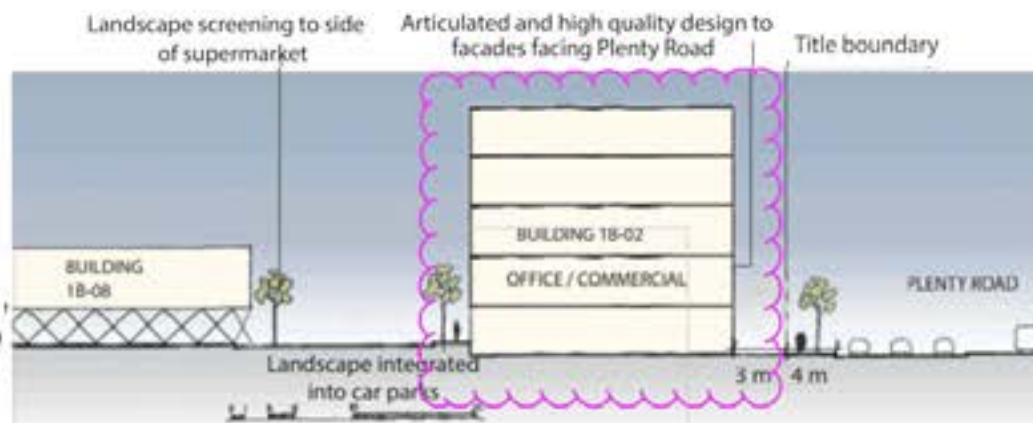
Indicative Section through buildings fronting onto Plenty Road
